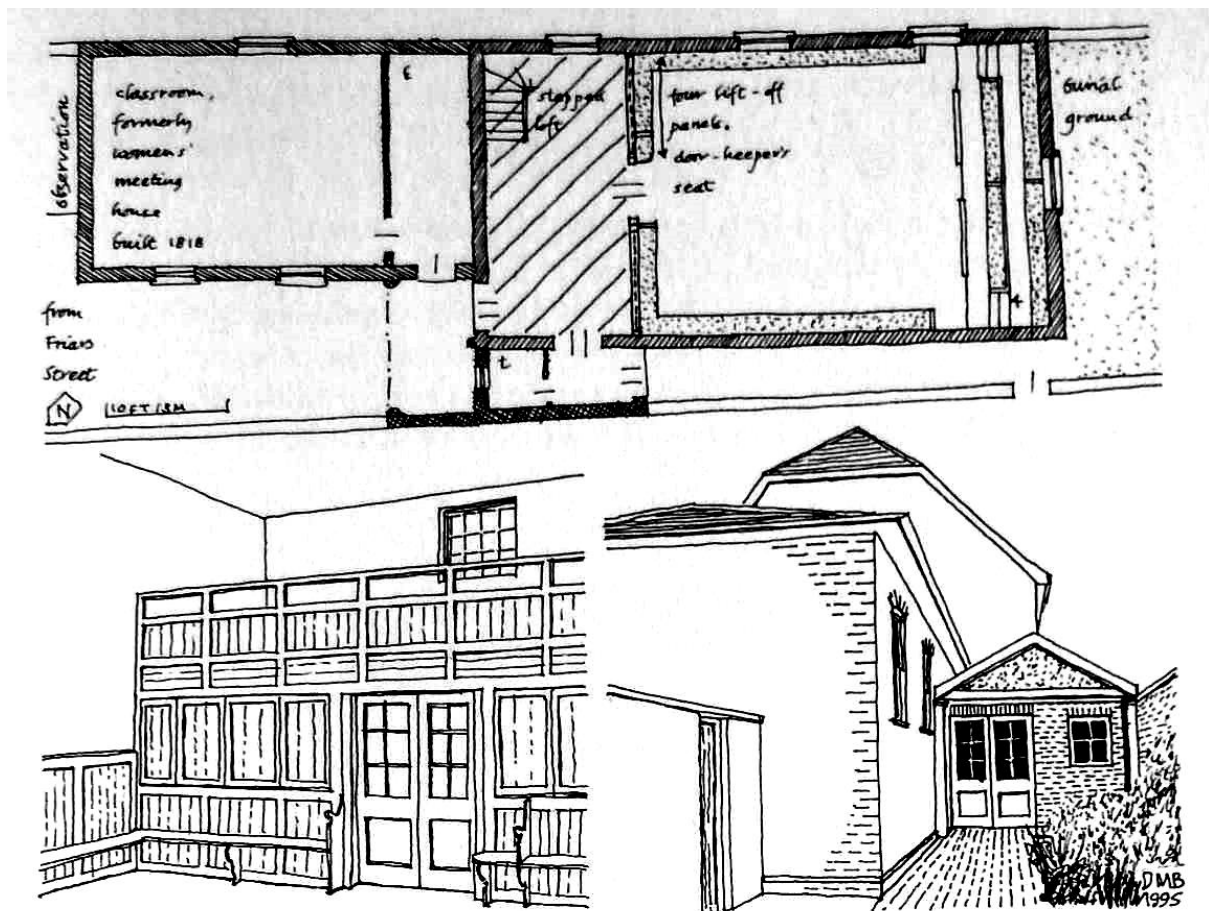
Plan and internal elevations (before recent additions), from Butler, p. 575
